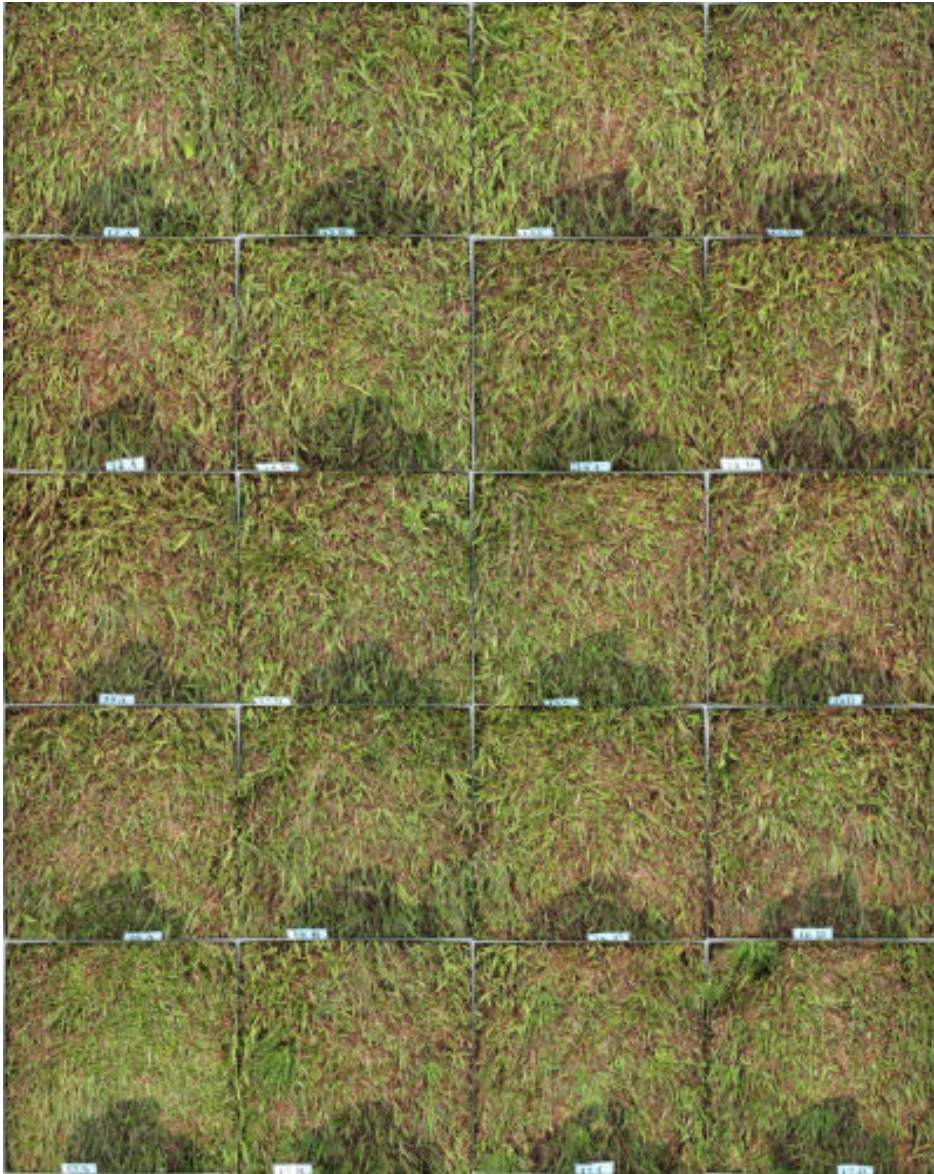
60x1, 13 to 17 m from the dike crest, section YB3.
